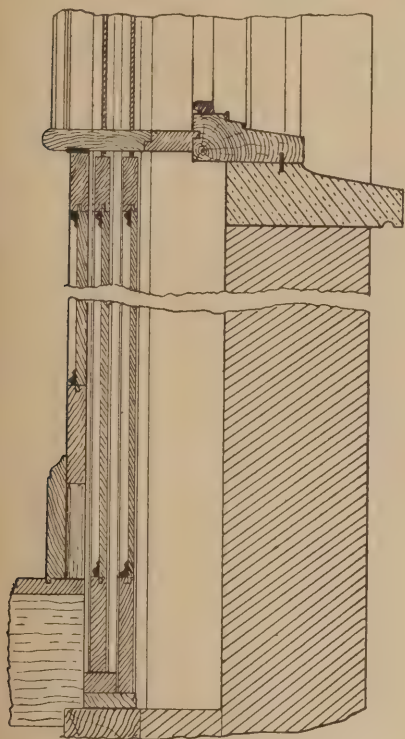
VERTICAL SECTION OF SLIDING SHUTTERS.
